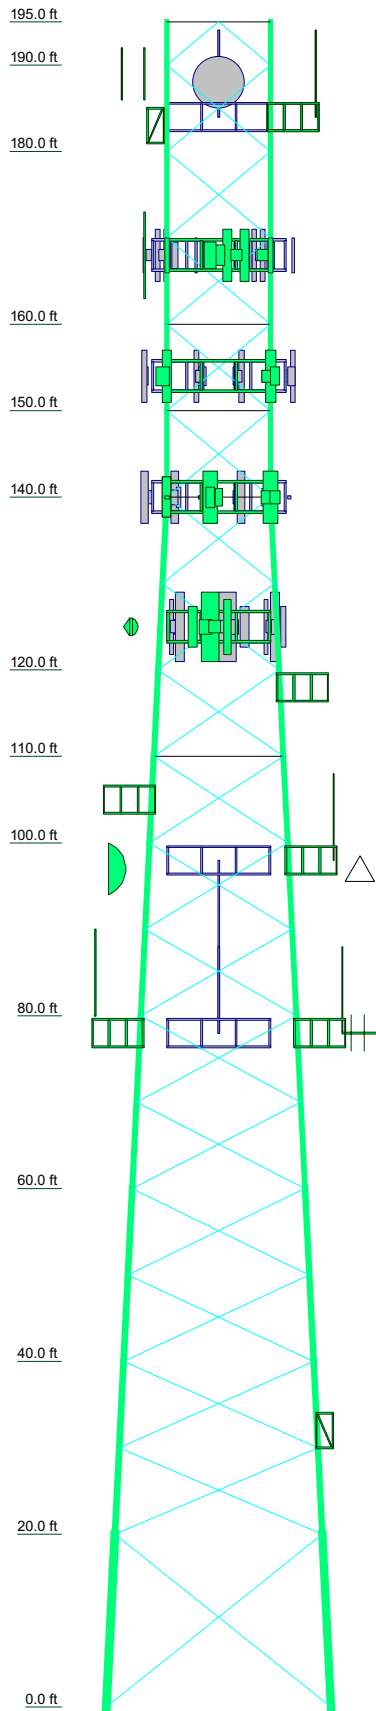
Photo illustrating the Tower with Appurtenances shown.
